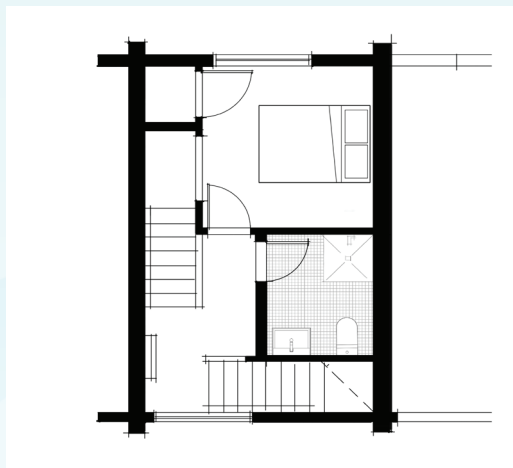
8–10 Yeovil Road, Te Atatu: a site developed at a density of 134du/ha without on-site parking. The middle floor-plan of a three-storey, two-bedroom terraced house-type. Image: Peter McPherson.
